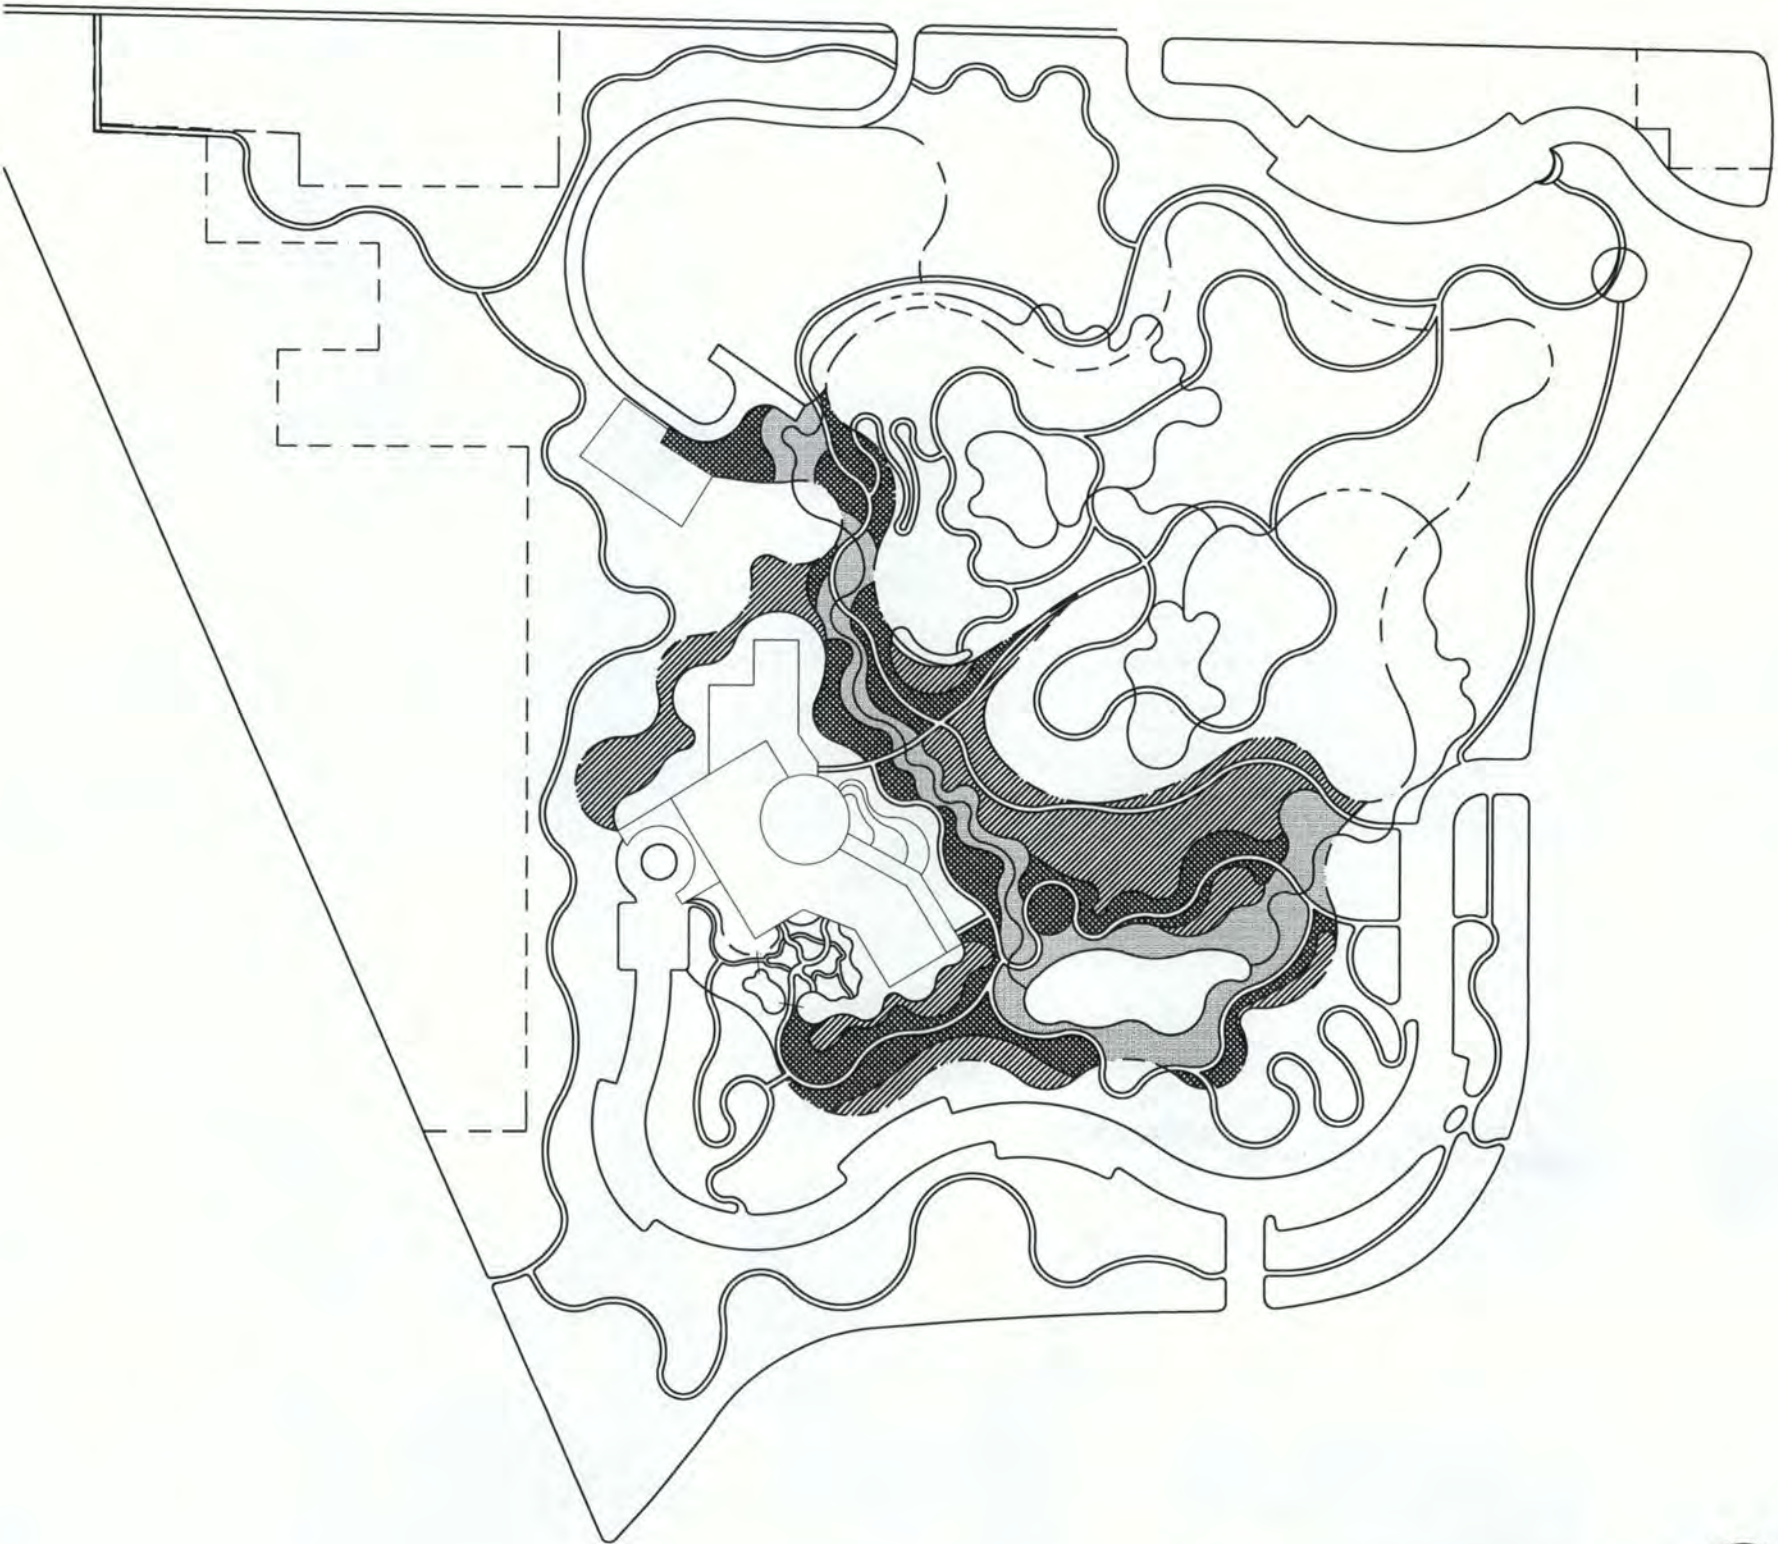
Maple/Basswood planting plan and matrix.
